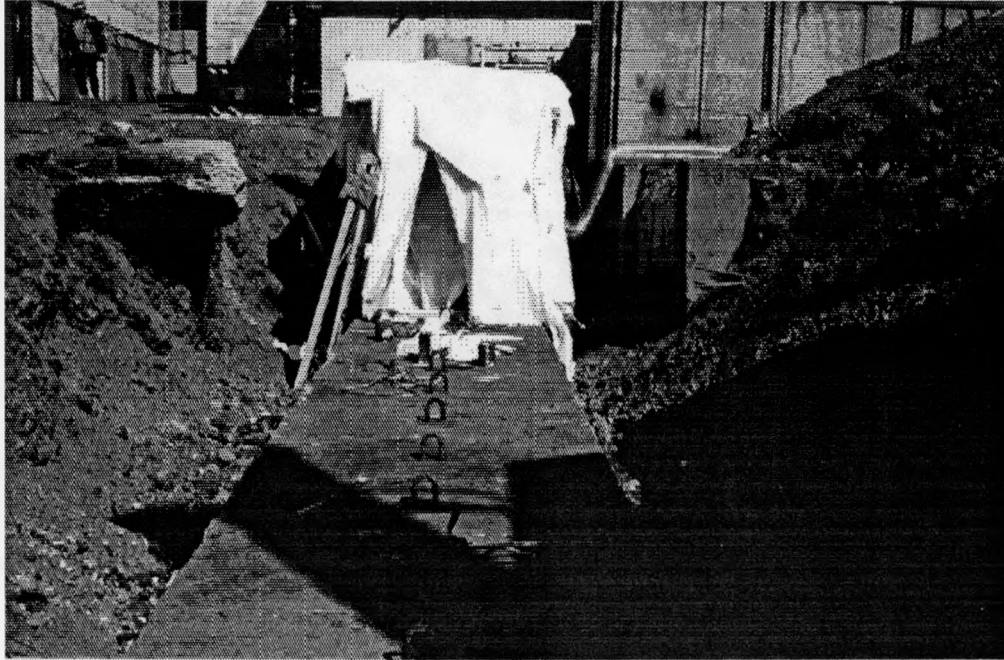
A portable containment tent in-place over a pipe trench in the East Yard (110/29).
